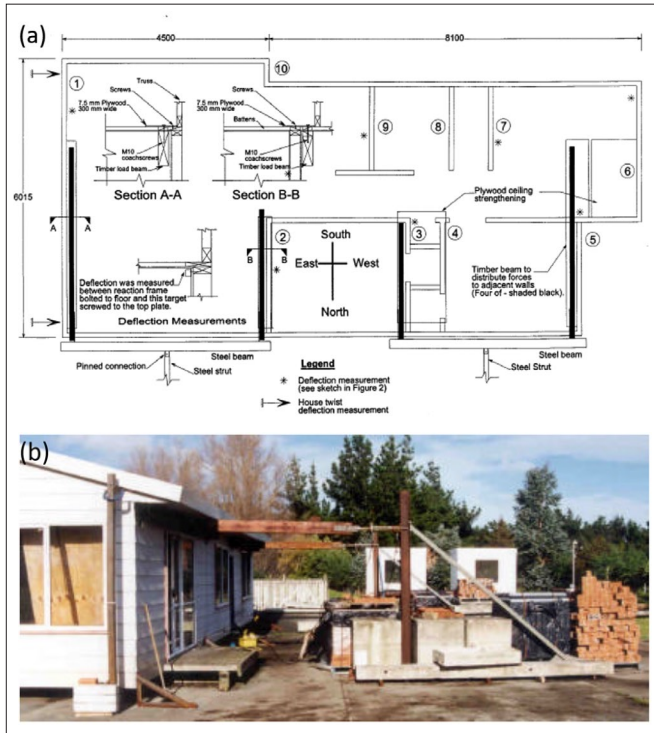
Test house [39]: (a) house plan; (b) general view of test in progress.
